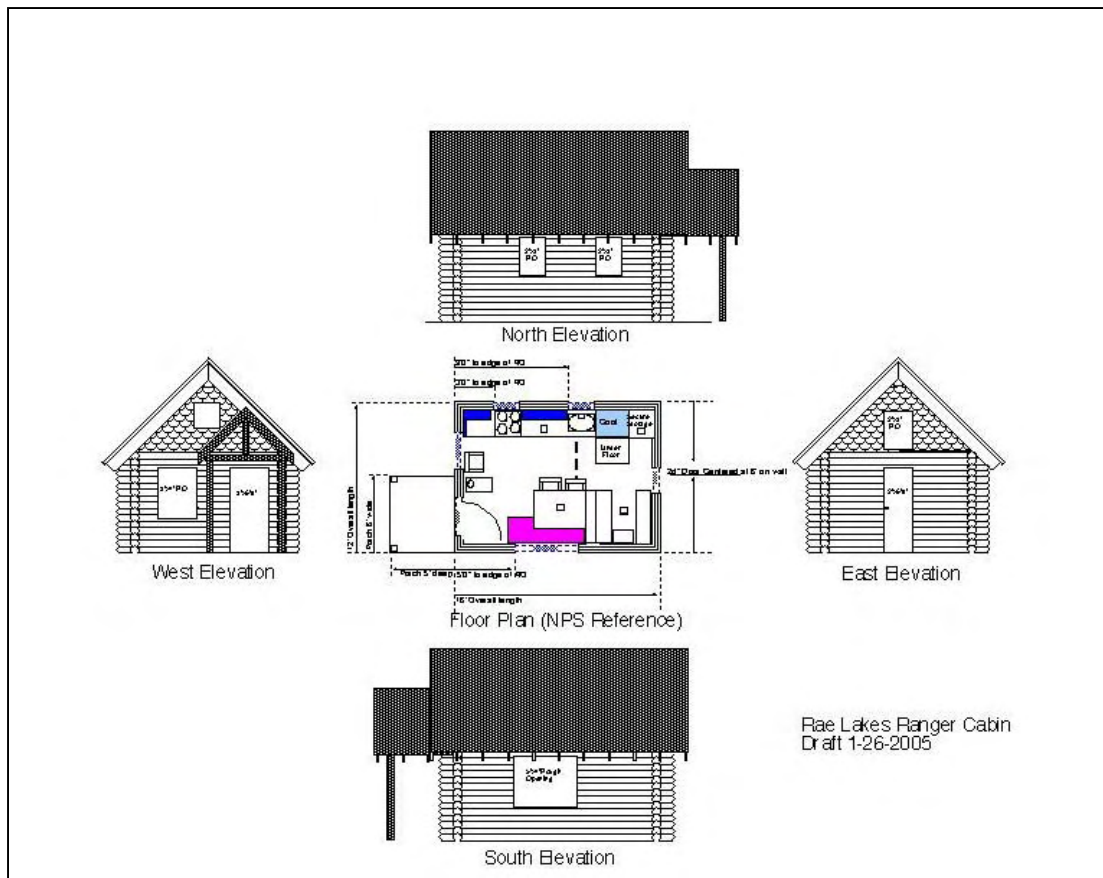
Typical Building Plan for Ranger Stations (Rae Lakes diagram shown)
